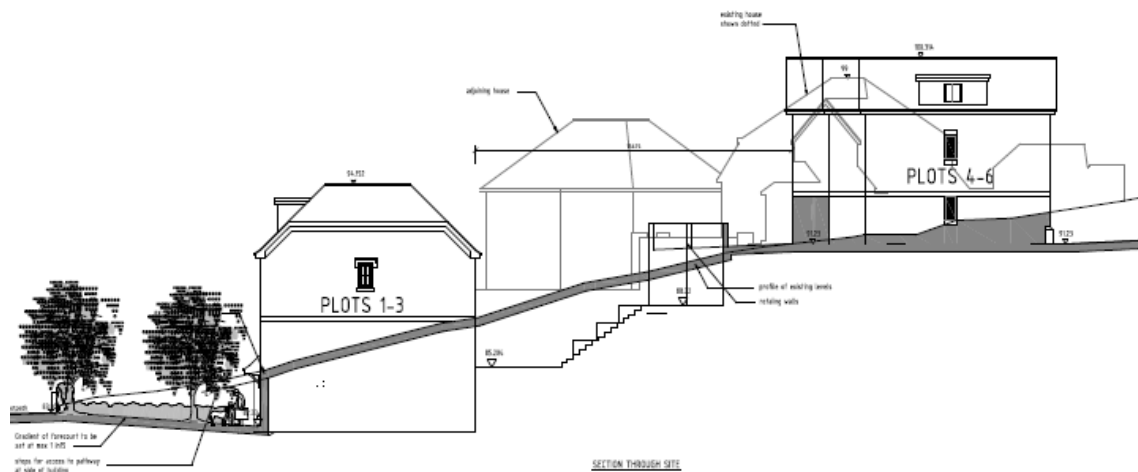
Section through the Site – Viewed from 7 Croham Valley Road and 7 Ballards Farm Road
